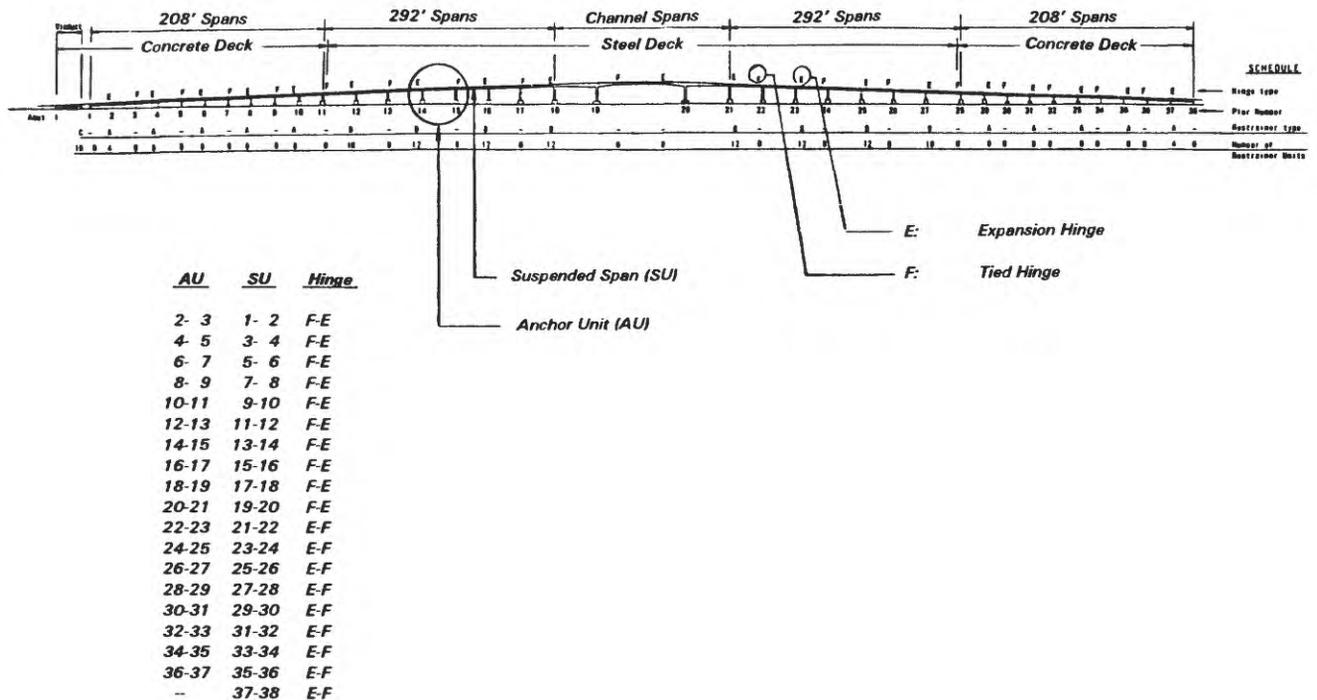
Elevation drawing of the steel portion of the San Mateo-Hayward Bridge (courtesy of the Cygna Group).
